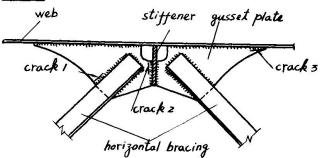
Cracks at the toes of fillet welds of the gusset plate of horizontal bracing
